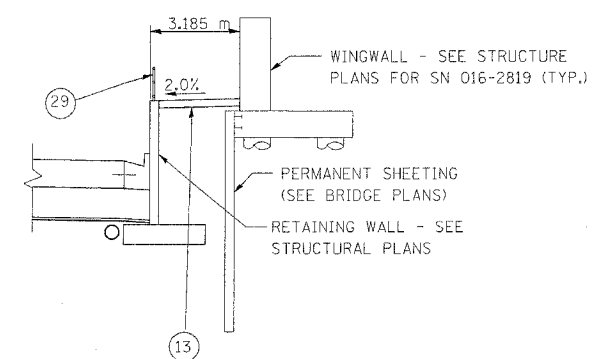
DETAILS @ N. SIDE FROM STA. 2+832.796 - STA. 2+842.814 (STA. 92+93.93 - STA. 93+26.80)
